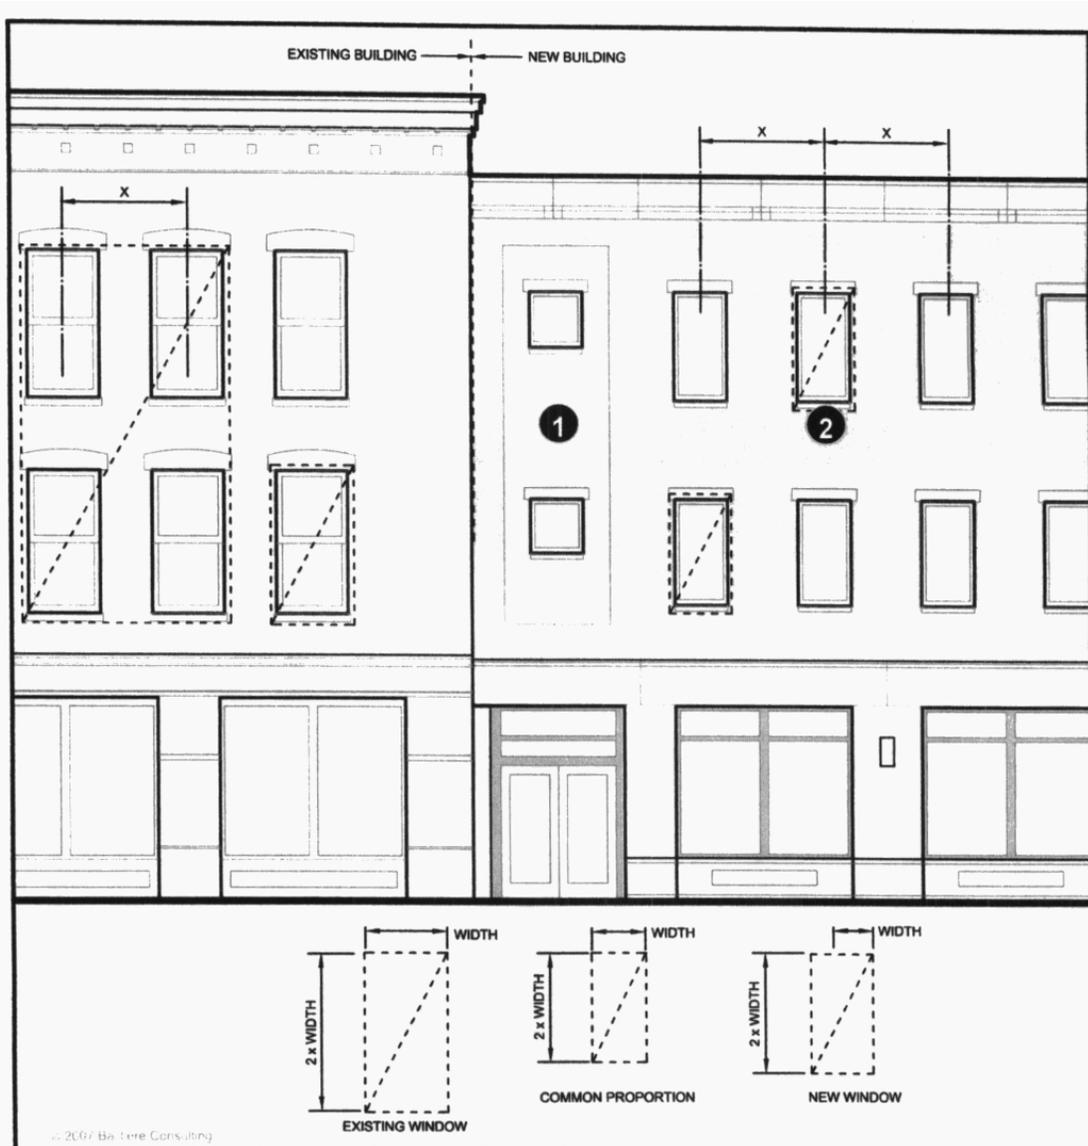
(above): New construction, especially at infill sites, should work to maintain the street wall and have a compatible façade composition with those buildings around it.
